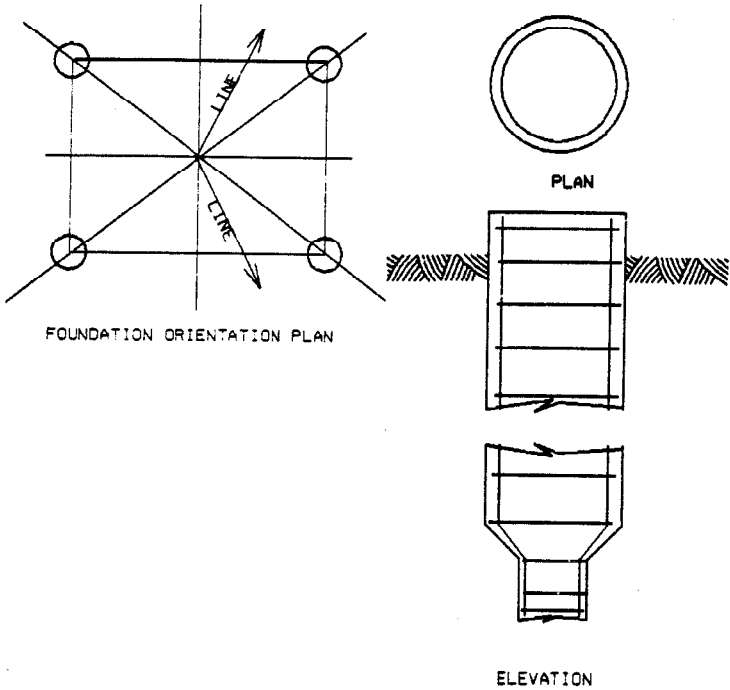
Single Cast-in-Place Concrete Pile Foundation
